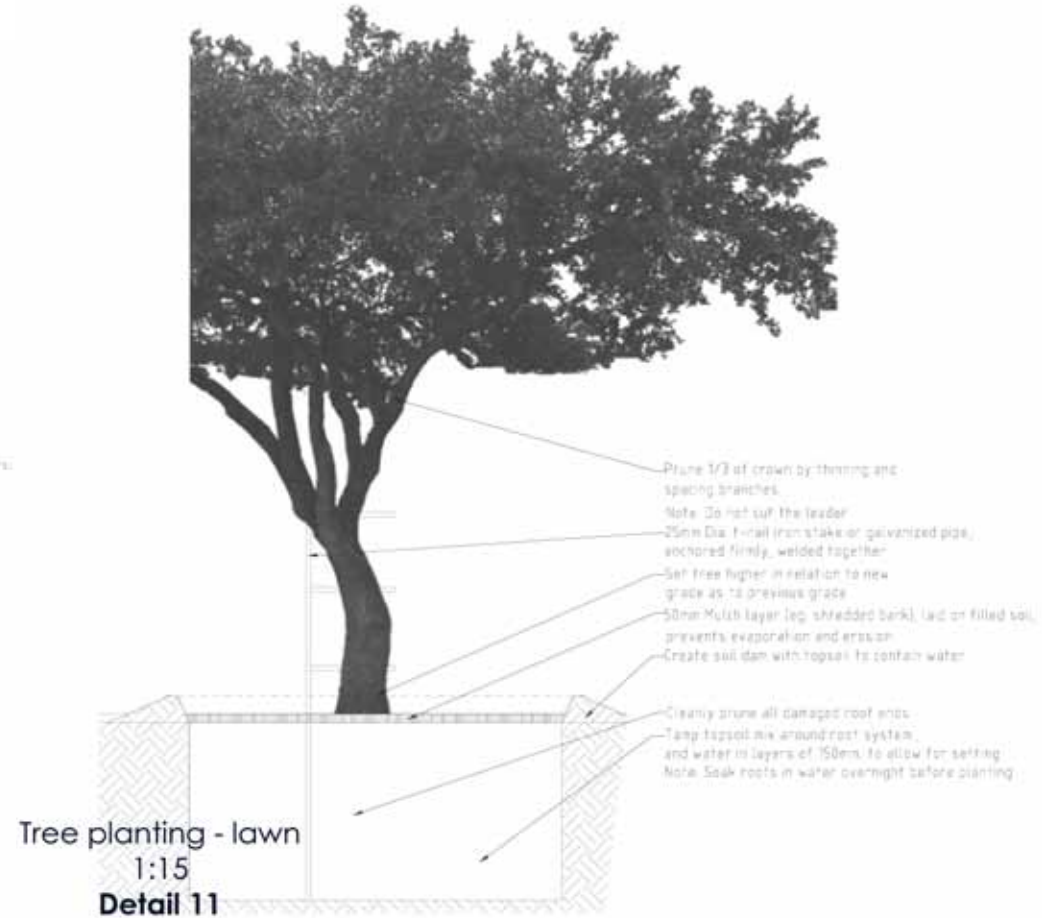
TREE PLANTING - LAWN (not to scale) (AUTHOR, 2011)
